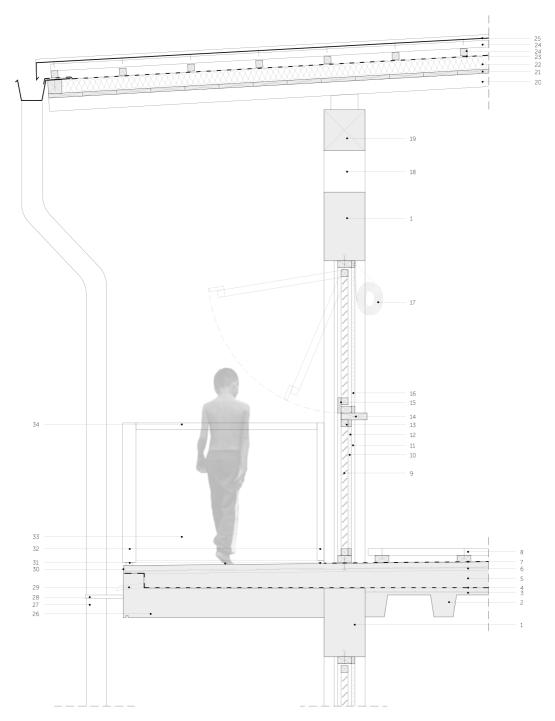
Detailed section of the $4^{\rm th}$ floor (see legend in the next page).
